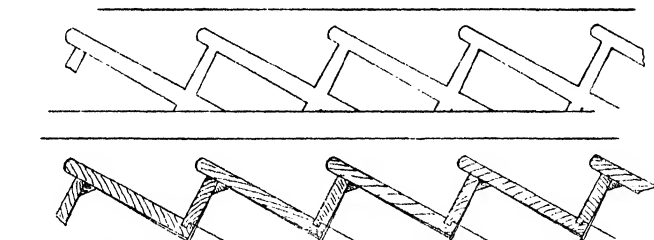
Showing 'marking out' and 'cutting' in Strings.
